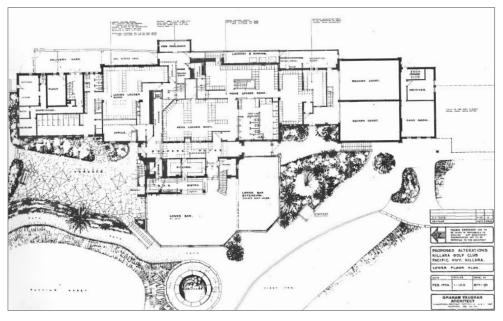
Ground floor plan for Lower Lounge extensions and other works, 1996, by Graham Vaughan.
